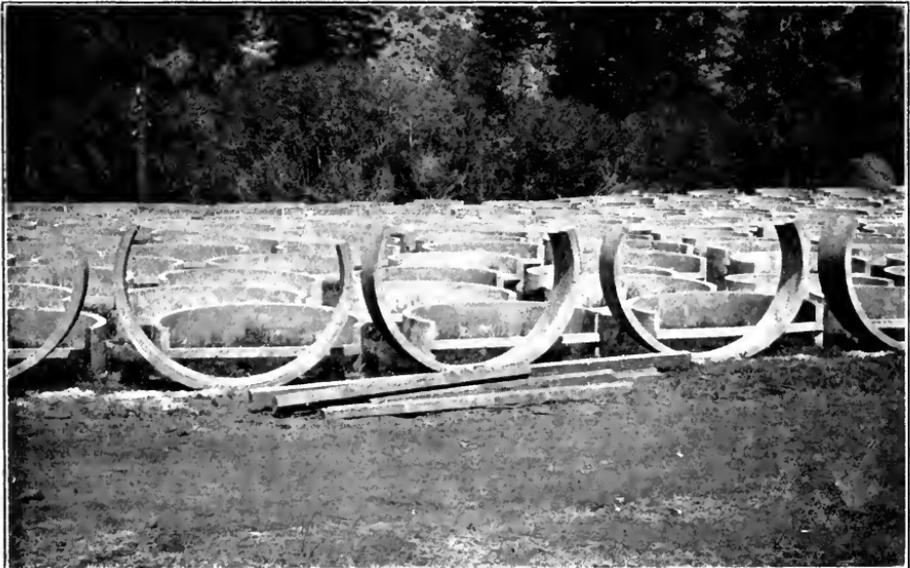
FIG. D.—Reinforced concrete shapes at manufacturing yard. Tieton Project, Wash.
